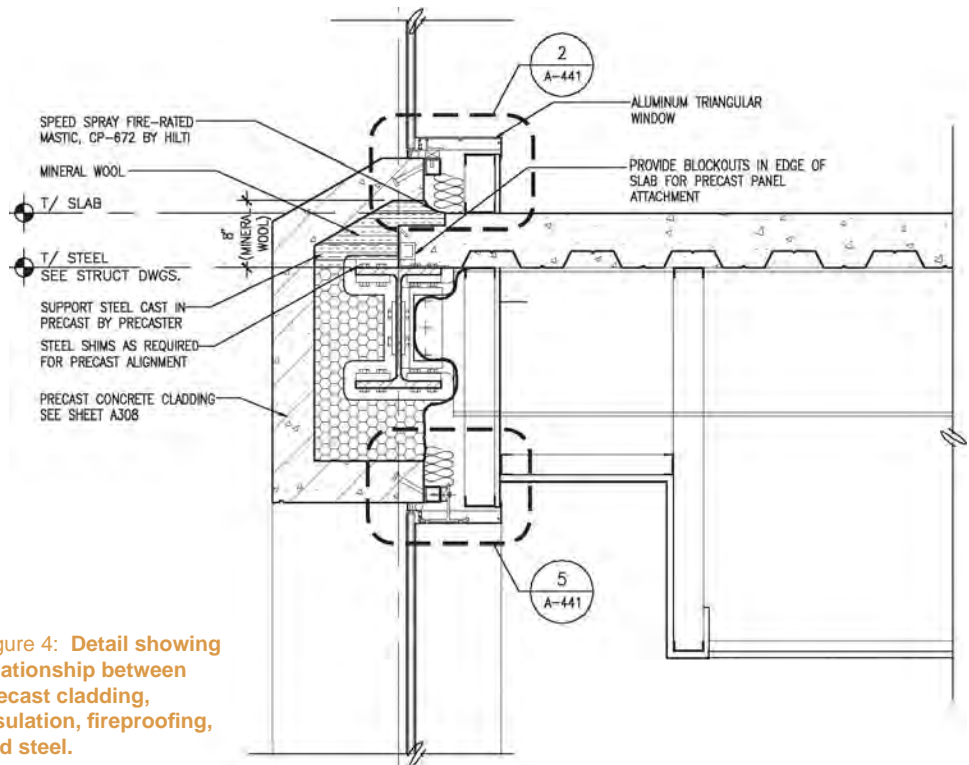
Detail showing relationship between precast cladding, insulation, fireproofing, and steel.
